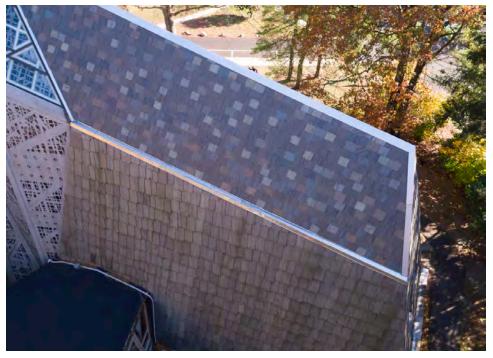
View of roofing and wall slate at the west end of the north elevation. The roofing slate in this area was previously replaced and varies in color from the slate over the Narthex; this work is assumed to be part of the 2003-2007 waterproofing campaign. In accordance with the original design, the roofing slate is laid in uniform horizontal lines while the slate wall shingles exhibit more variation.
